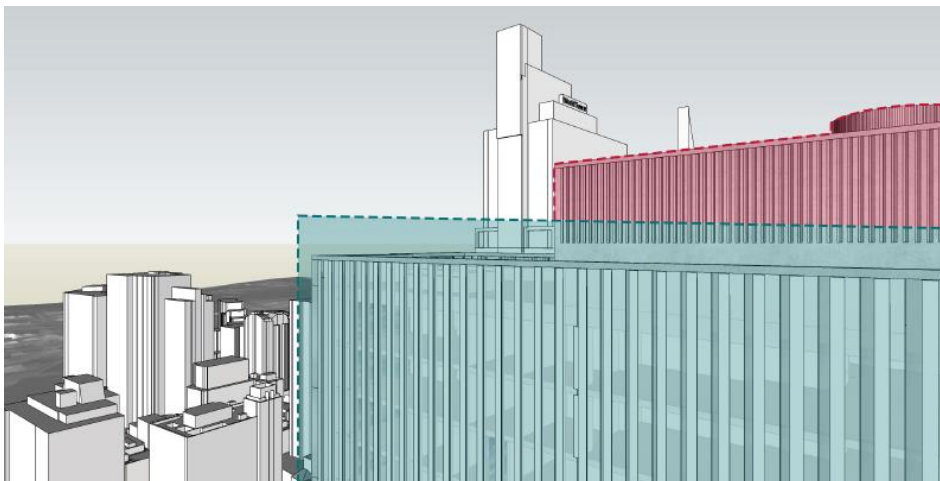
View F.2 - View perspective from apartment at Level 47, approved building envelope identified in blue, amended envelope outlined in red
